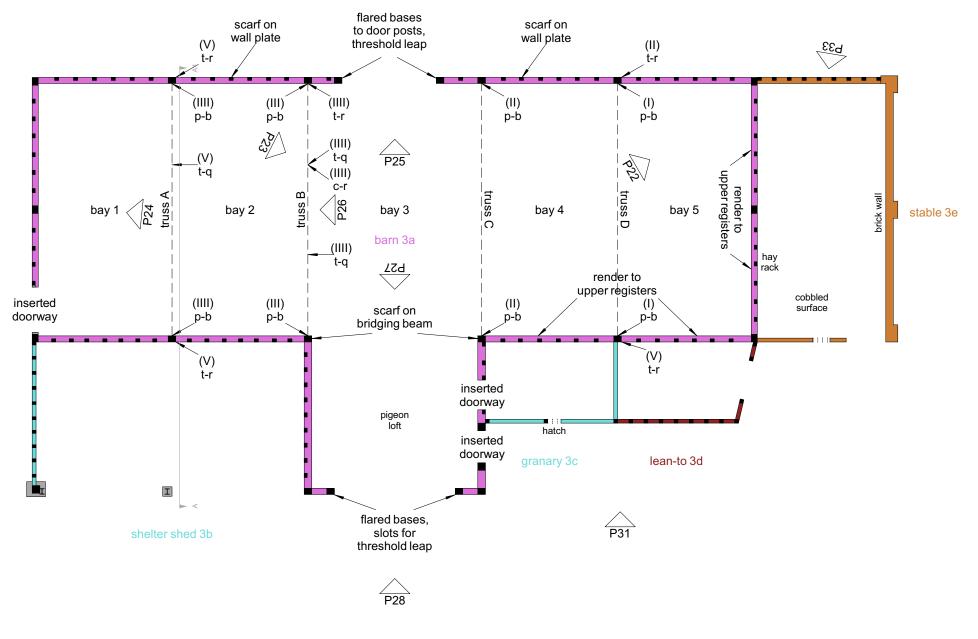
Structure 2, floor plan showing location and orientation of photographs included in the report.
